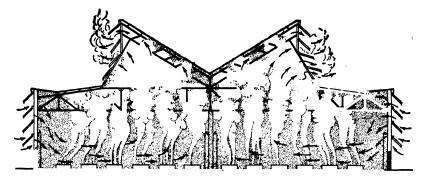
Cross-Section of a Typical Foundry with M-Shaped Roof Truss
